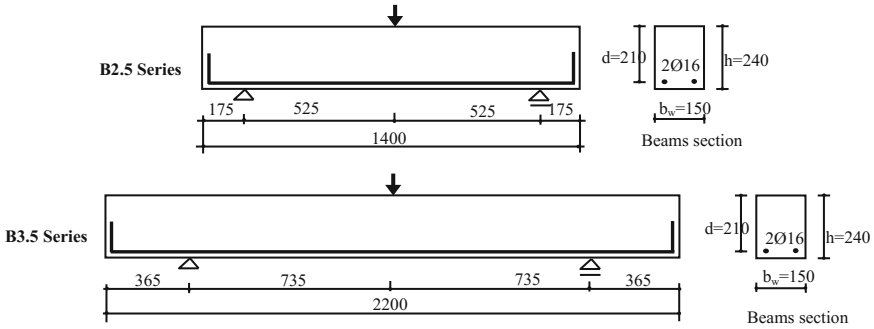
Geometry of beams and flexural reinforcement arrangement (unit: mm)
